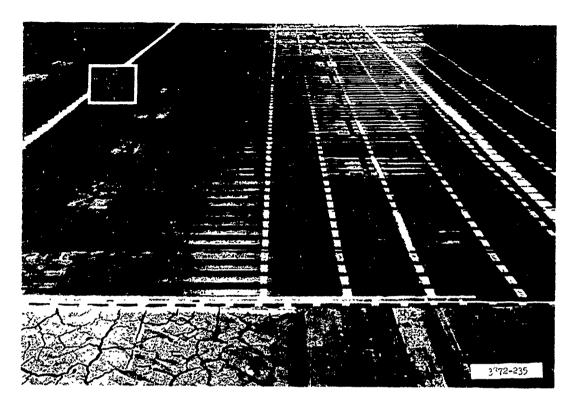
Test section I, lane 1, item 4, prior to traffic
